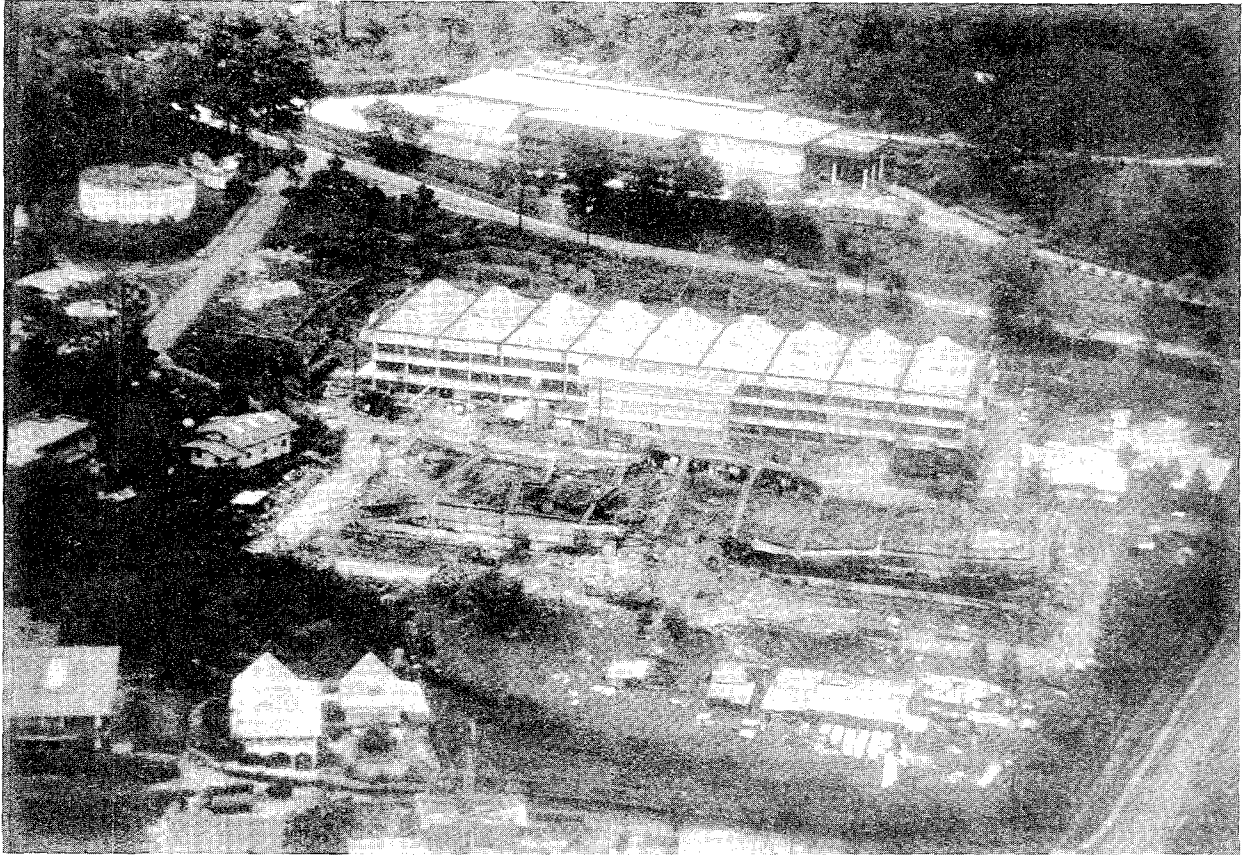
Standard Factory Building 1 (standing, center) and Building 2 (collapsed, foreground), Baguio Export Processing Zone. The foundation of Building 1 was cut into a gentle hillslope; the foundation of Building 2 was on fill. Minor cracking was detected in road (center) parallel to long direction of collapsed building.
